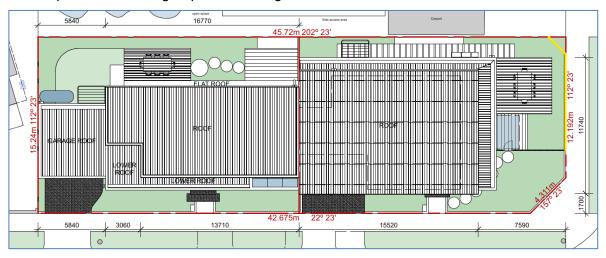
Site plan with the extent of the 1.8m timber fence on the Clonmore St frontage highlighted (yellow). The remainder of the frontage is unfenced or a small retaining wall due to the site slope.
